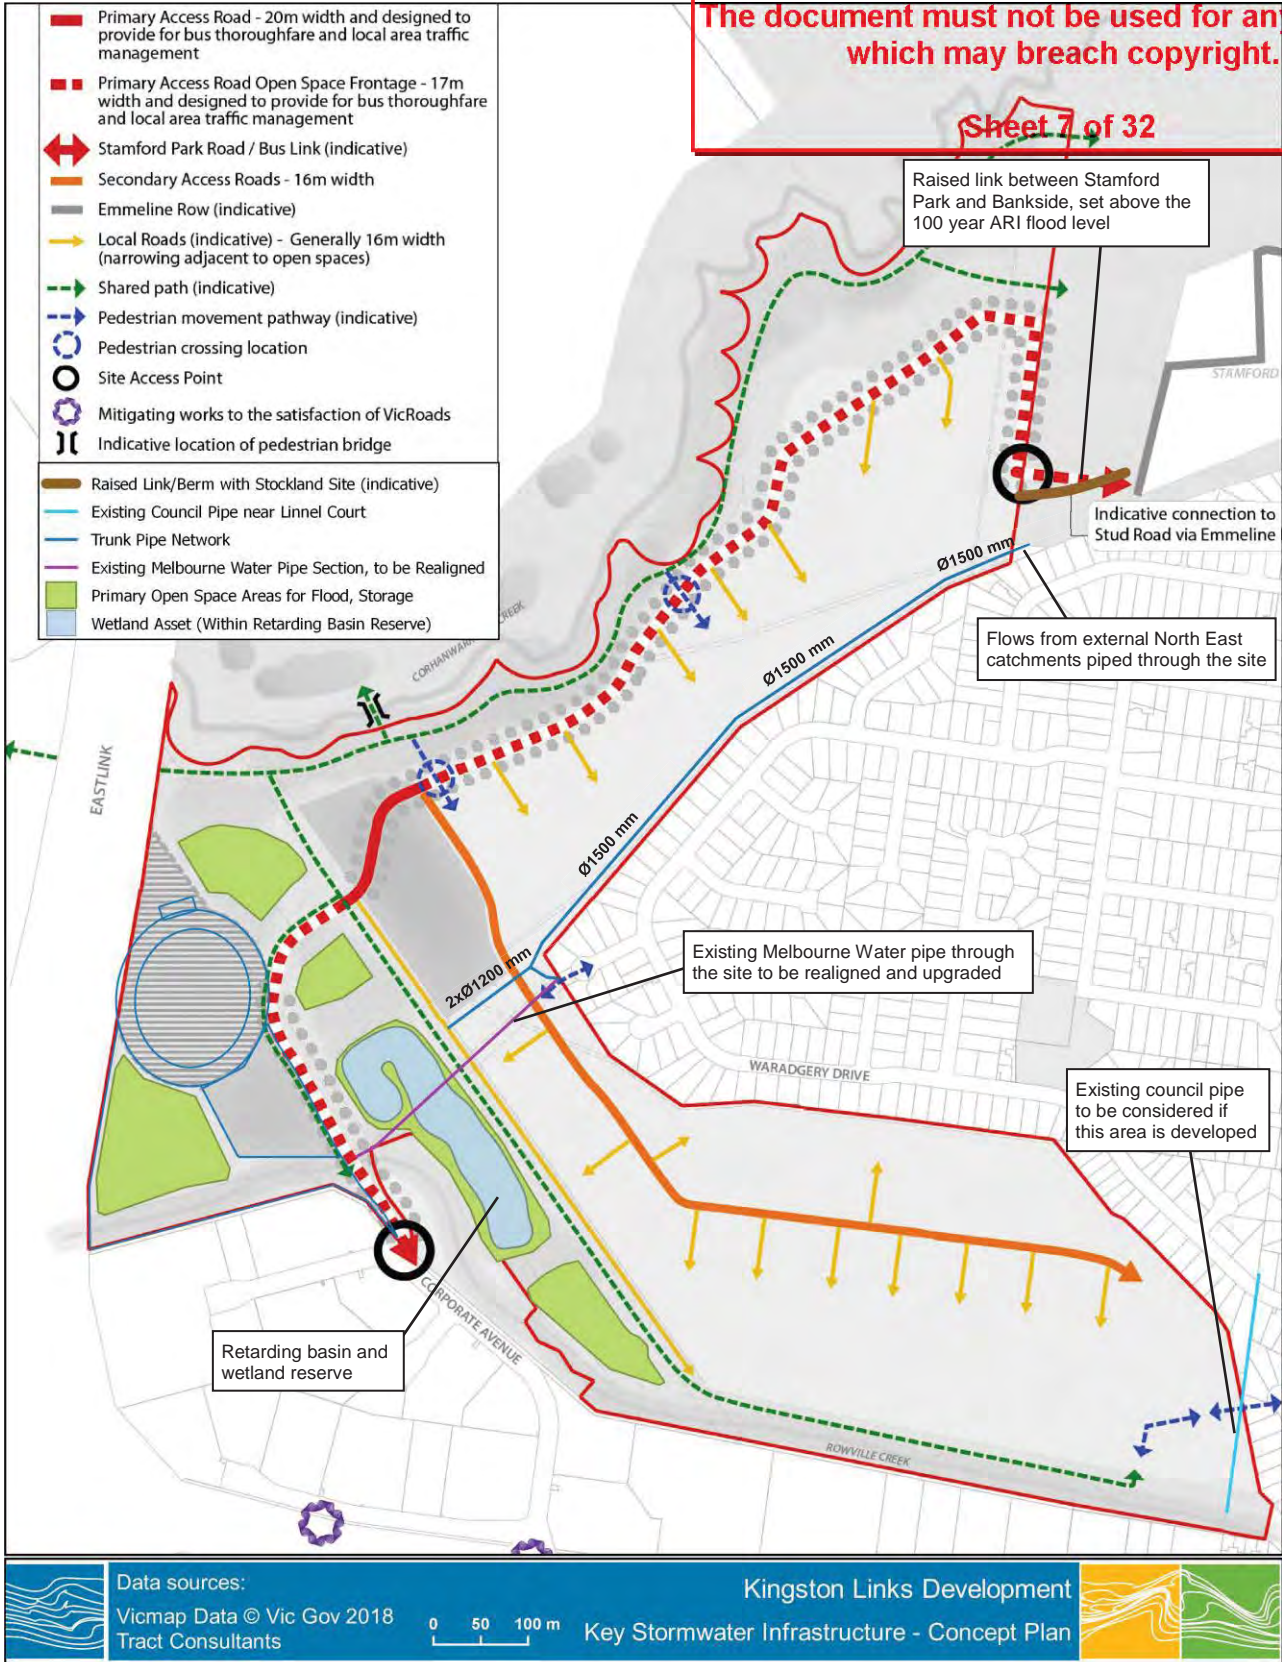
Stormwater Management Infrastructure - Concept Plan
